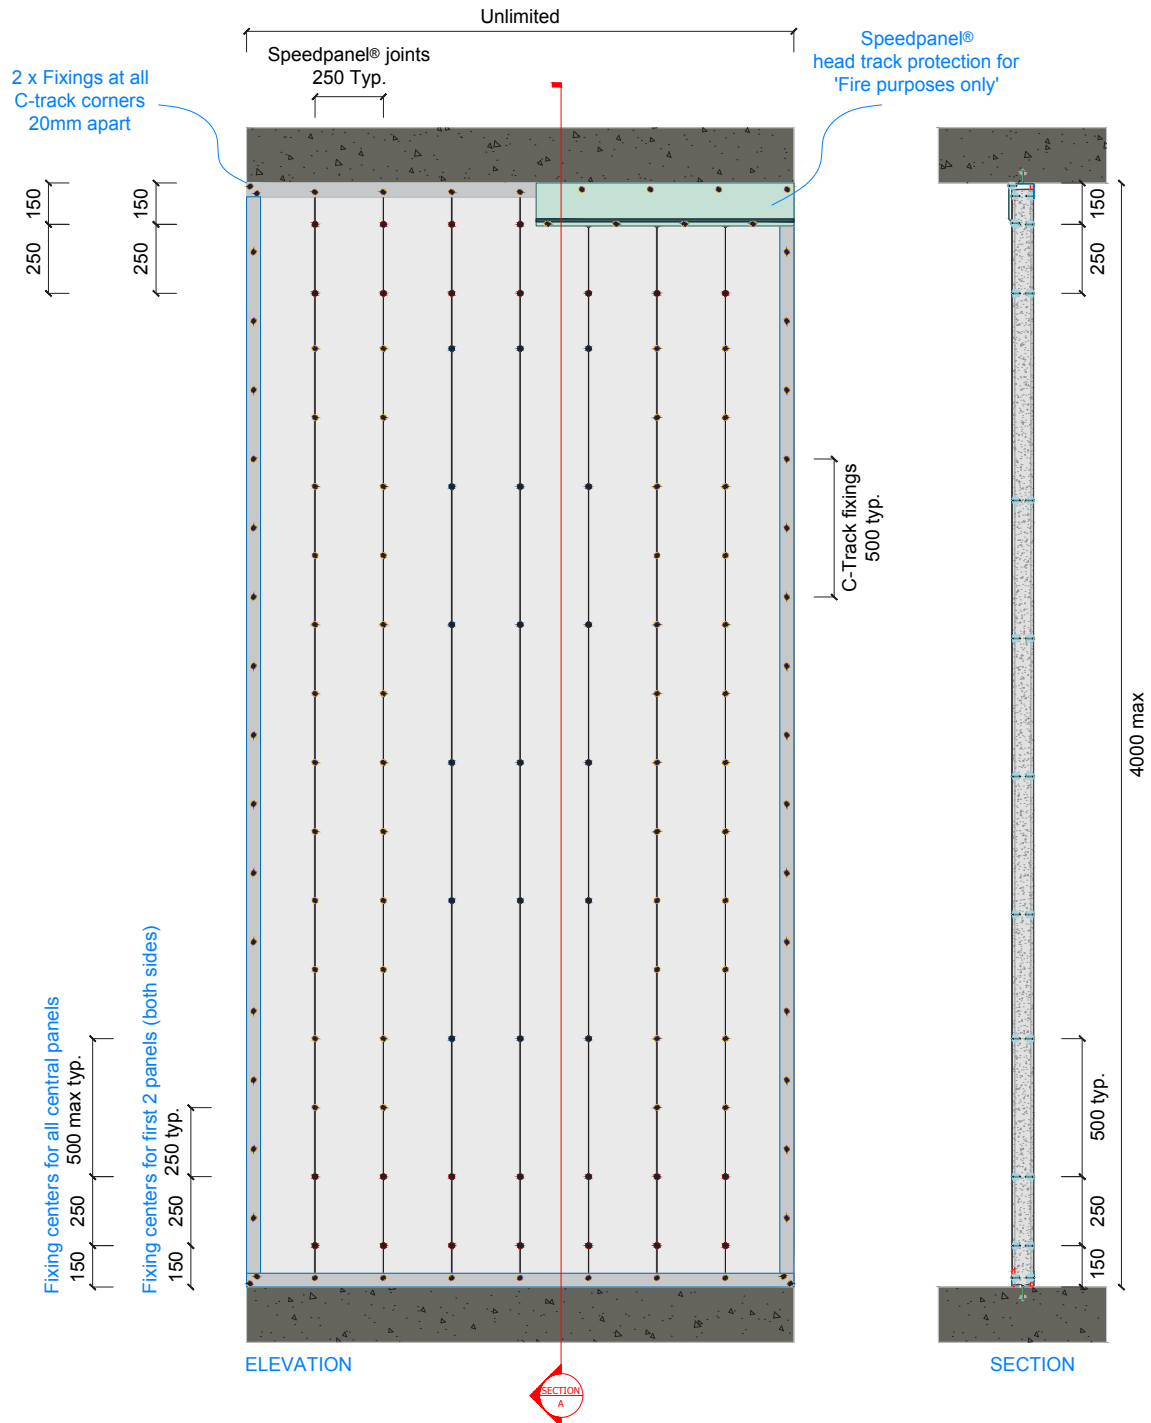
SYSTEM 'C' (ELEVATION & SECTION SYSTEM FIXING LOCATIONS & SPACINGS (CENTRE TO CENTRE))
